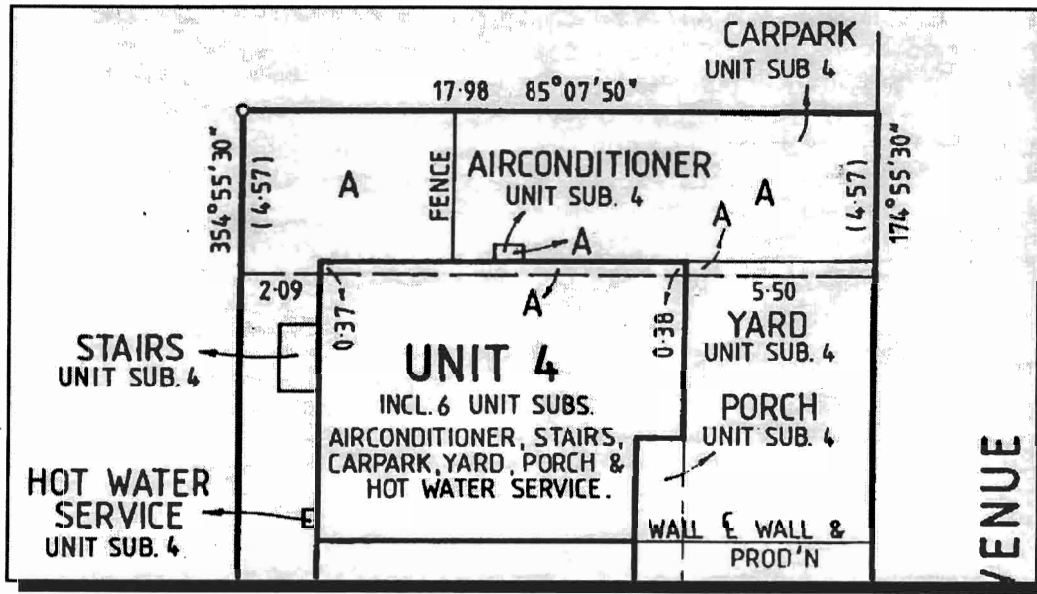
DELINEATION OF A NEW EASEMENT ON A FLOOR PLAN.
